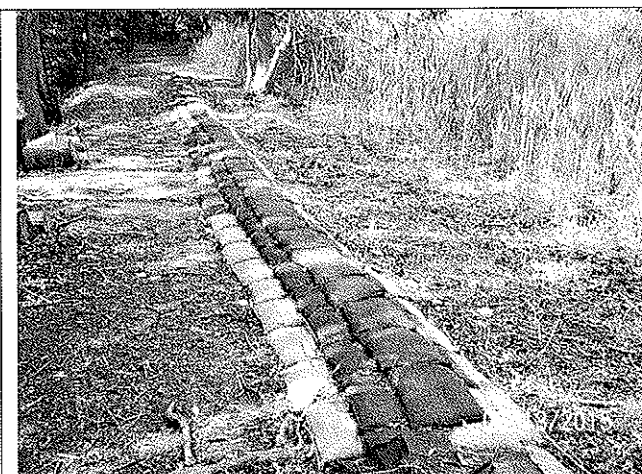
Sand bags installed along previously observed overtopping along Ash Pond A.
